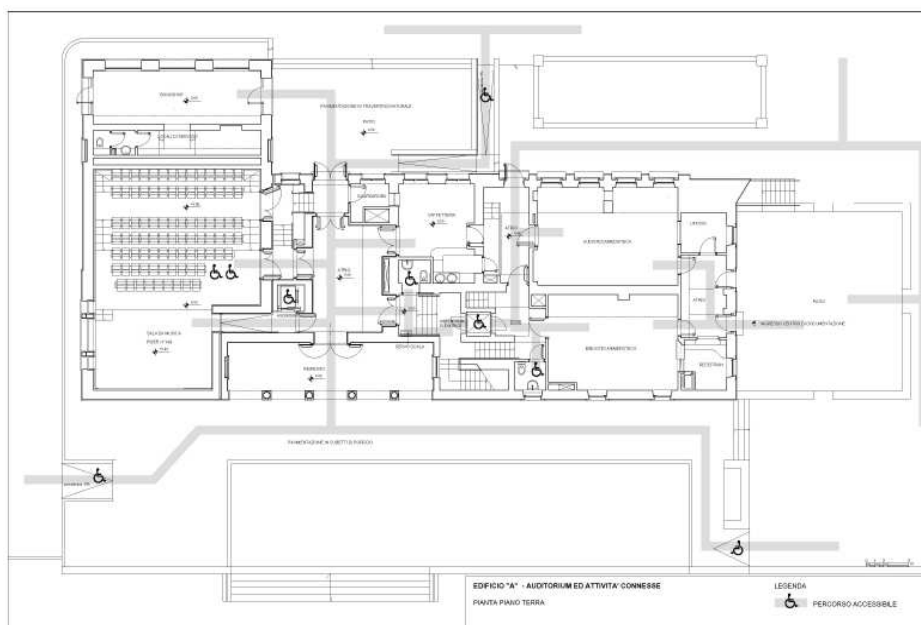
'A' Building, ground floor (Zetema, 2005)
